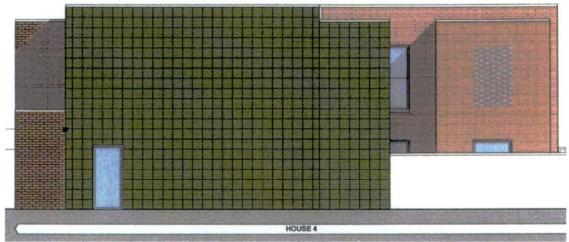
Overbearing blank "green" side elevation of House 4 would overbear onto the property to the north
